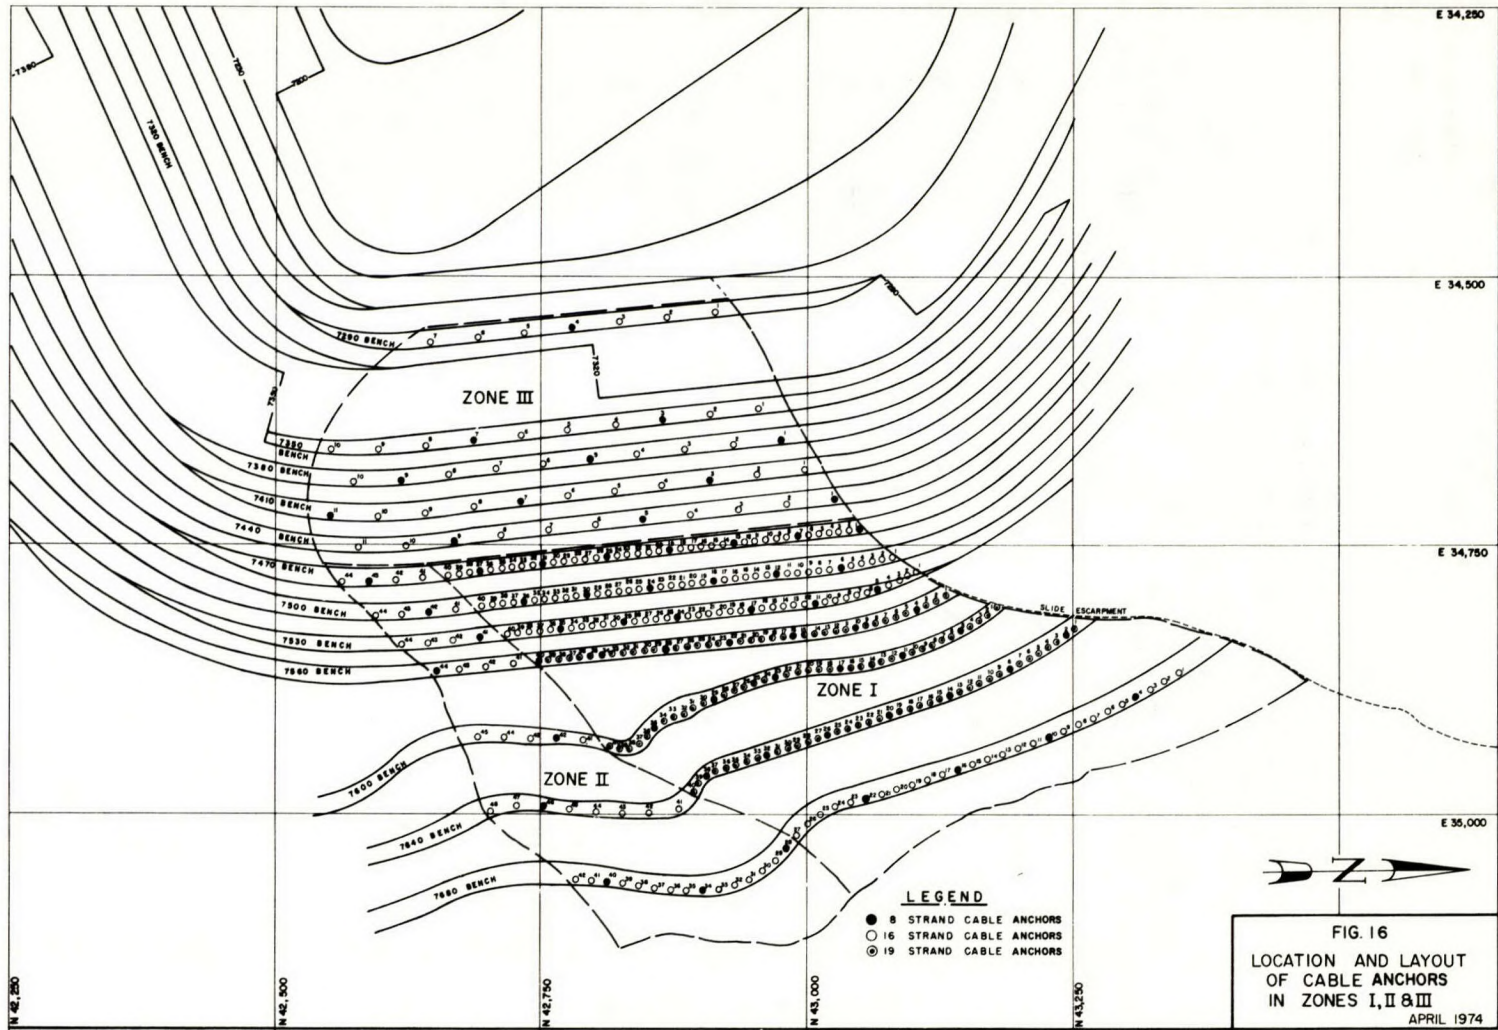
Location and layout of cable anchors in Zones I, II and III
